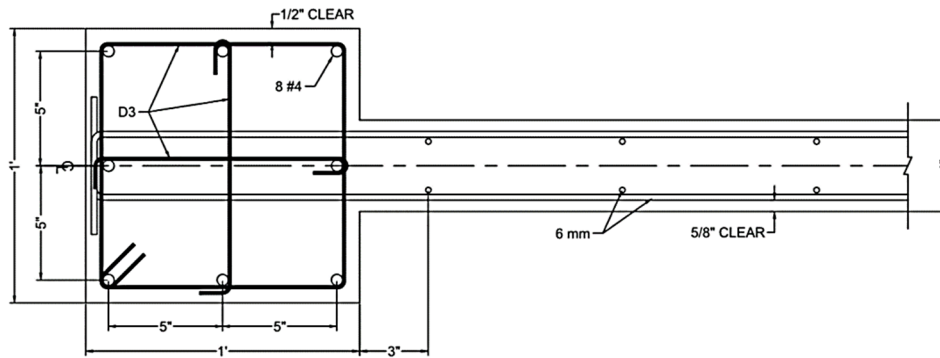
Shear Wall Specimen B1 – Cross Section (Oesterle et al. 1976)
